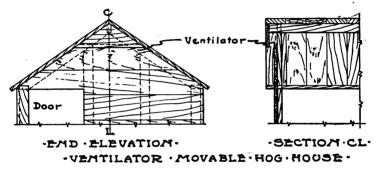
Detail of ventilation for Iowa movable hog house.
